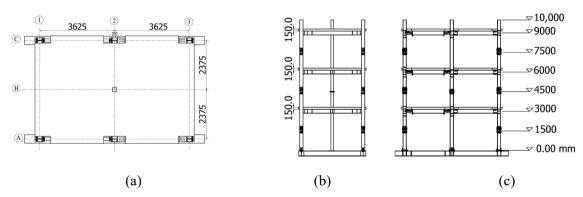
(a) Plan, (b) transverse, and (c) longitudinal views of the test structure (mm)
